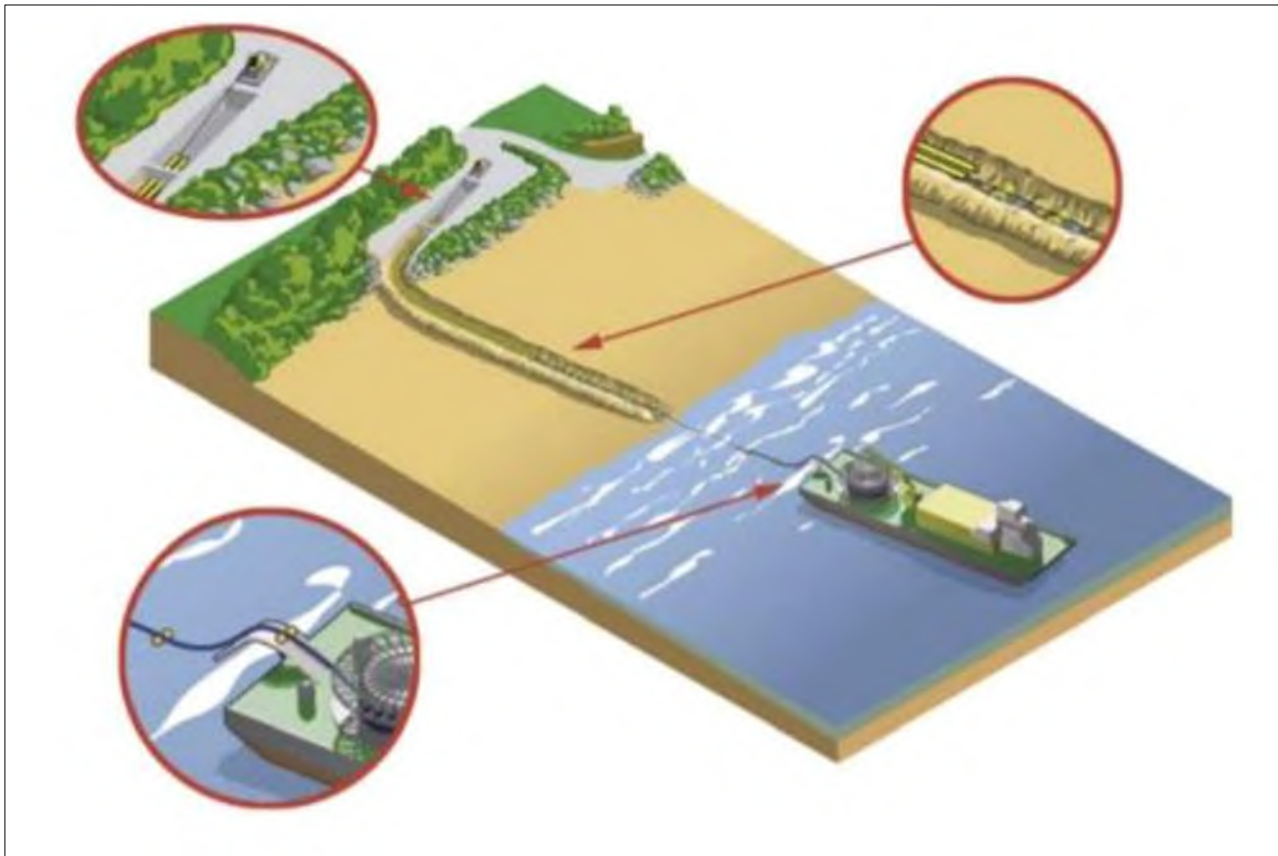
Image of Typical Open Trench Method (Source: EirGrid)
